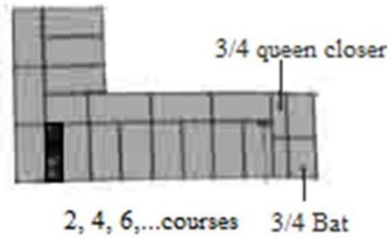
Plan of English bond (Wall thickness=1 1/2 Brick)
